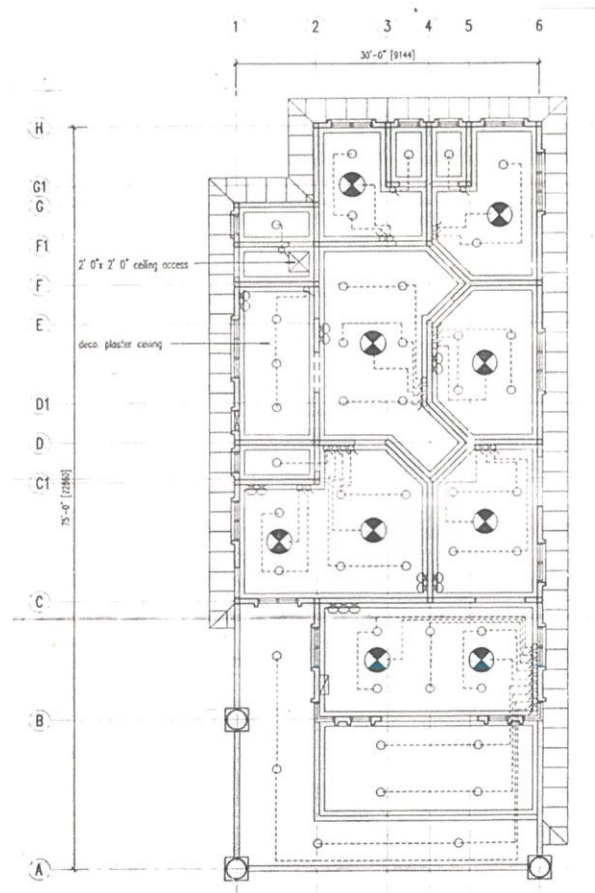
House Dimension of Bungalow House in Taman Dato' Wan, Ampangan
